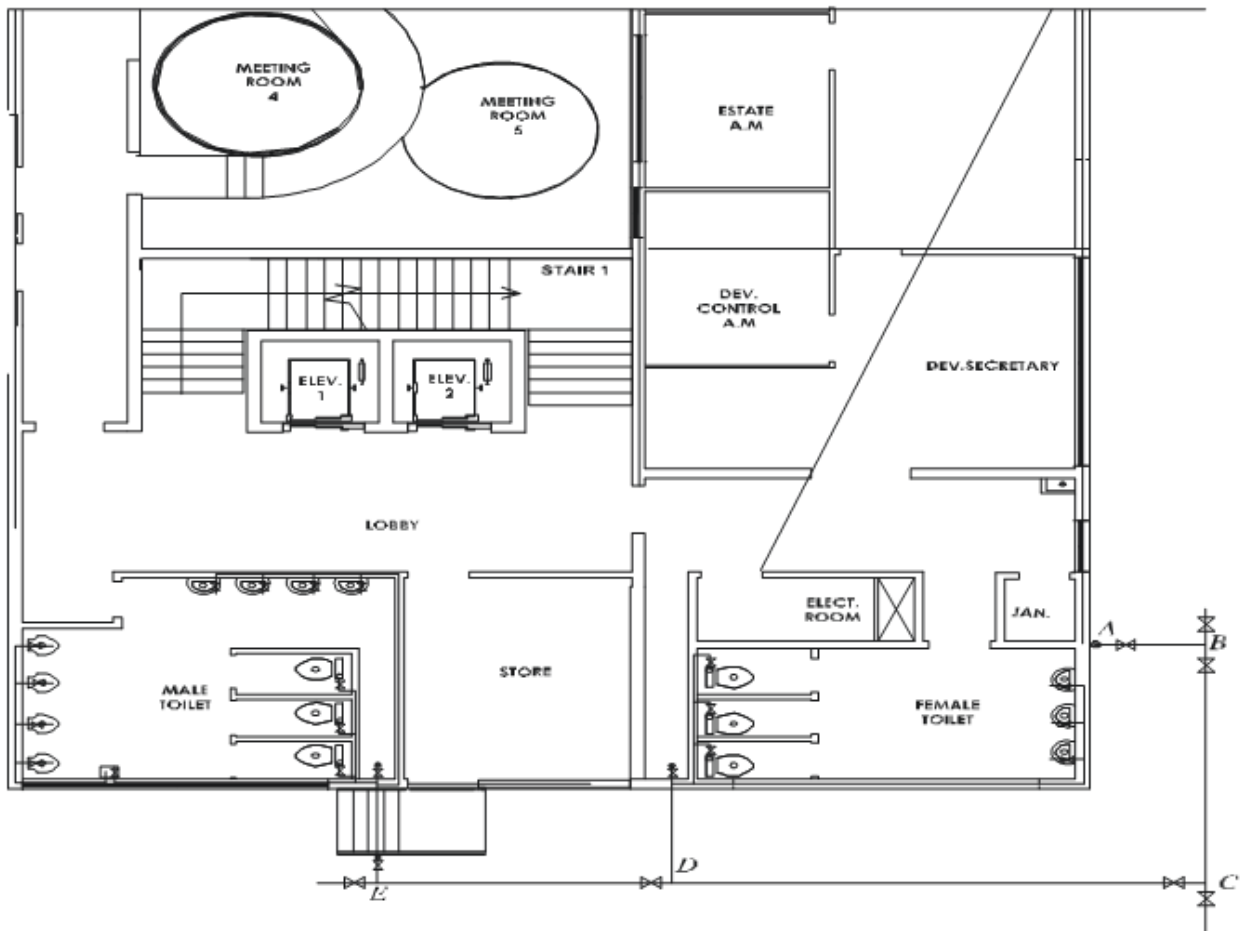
Typical Part Floor Plan for Distribution to 250-Occupancy Office Building
